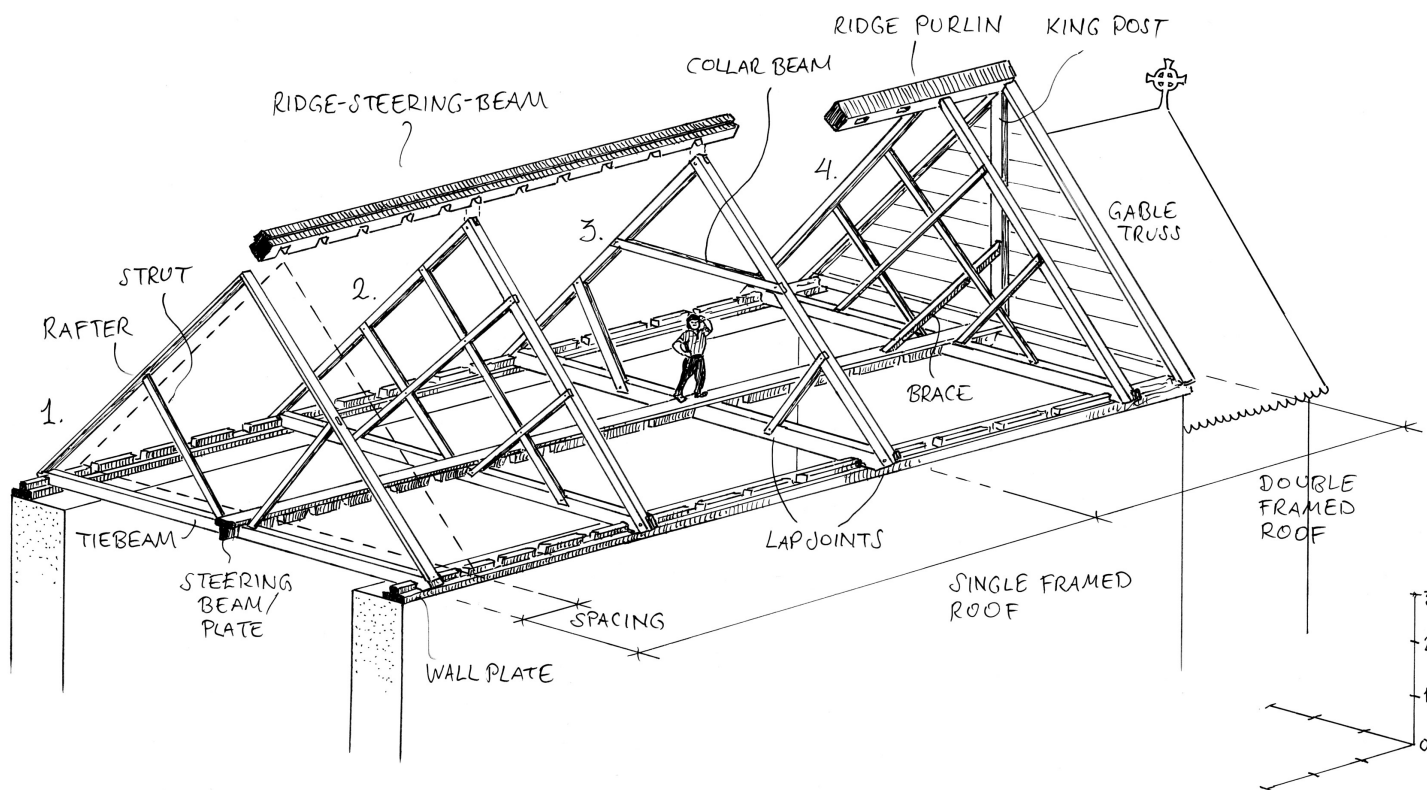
Terminology of tiebeam roofs, 12th and 13th century. 1. Truss with canted struts (assembled with tenon and mortise). 2. Truss with lattice of struts. 3. Truss with collarbeam and struts. 4. Roof with ridge purlin on posts and tiebeam trusses. Drawing by the author.
